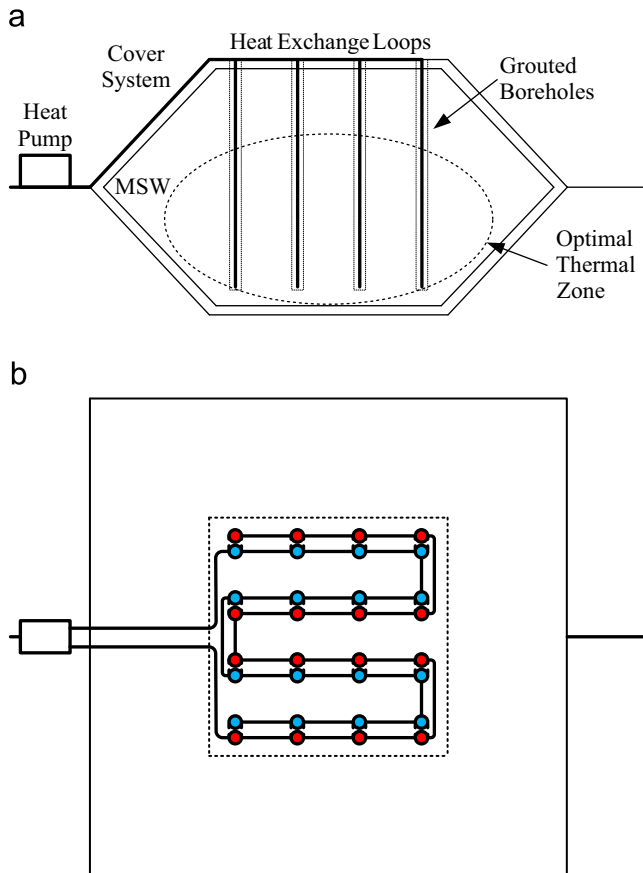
Vertical geothermal heat exchanger configuration for closed landfills: (a) Elevation section of vertical configuration; (b) Plan view of vertical configuration.
